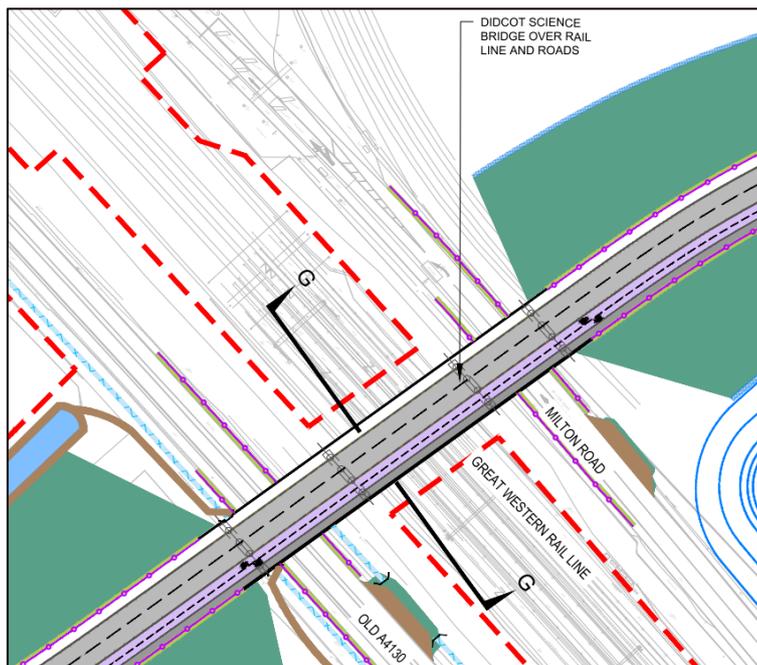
Proposed Didcot Science Bridge over the Great Western Railway
